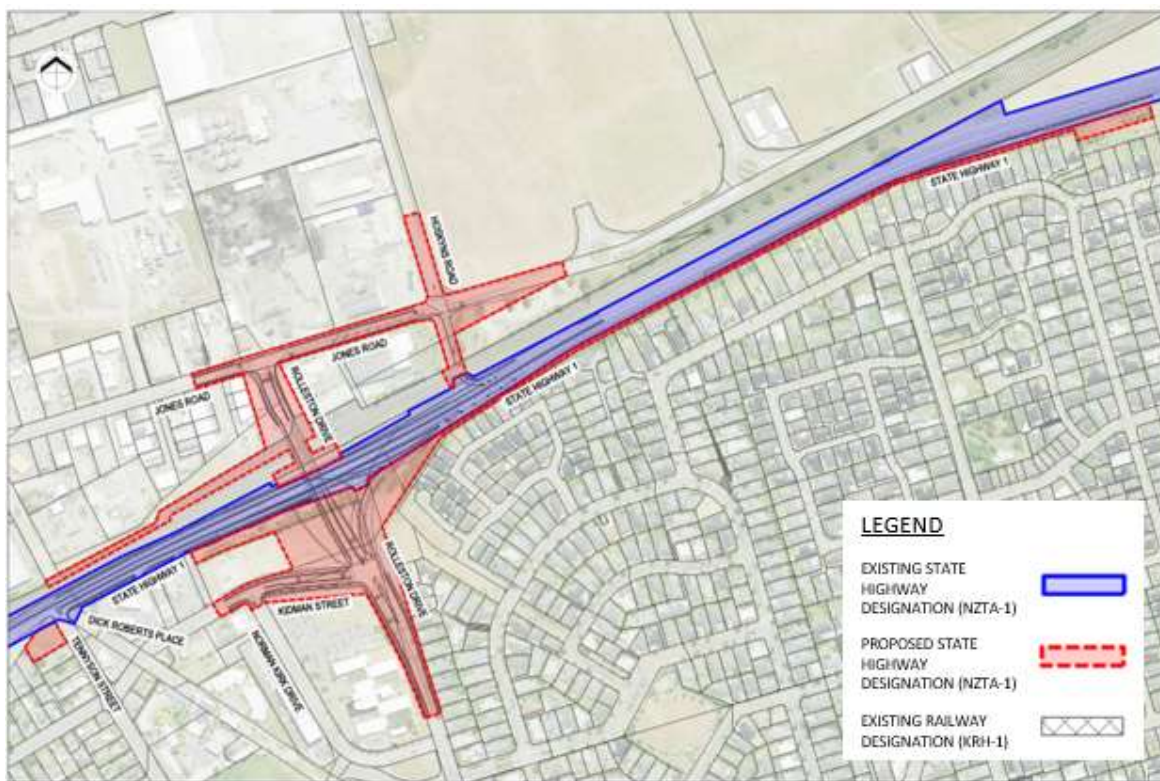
Proposed alteration to designation plan, listed as 'NZTA-1' in the POSDP
